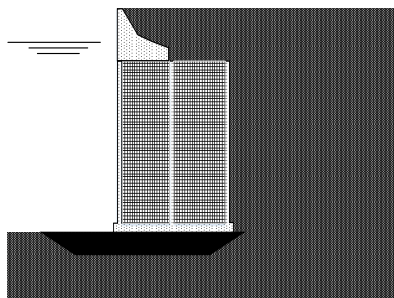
(b) provides a cross section of a prefabricated concrete block wall. This is one of the oldest techniques used for construction on quay walls. This technique is the modern equivalent to the ancient method for constructing quays using large stone blocks. Quays built using this techniques are usually constructed in a wet environment where each concrete block is lowered by crane on to the block below. The advantage of this technique is that it is highly durable as often these blocks are constructed out of mass concrete and thus contain zero steel reinforcement. The primary disadvantage of this technique is the mass of each block as an individual block can weight upwards of 100 tons. A further disadvantage is that current draught of ships in operation today require many more blocks to be stack in order construct a quay wall providing sufficient depth for a vessel to dock against.
